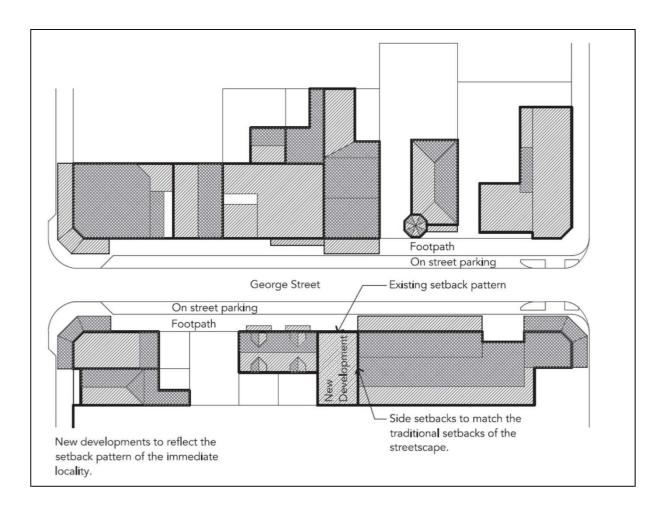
Site plan illustrating existing setback patterns and compatible new development.
